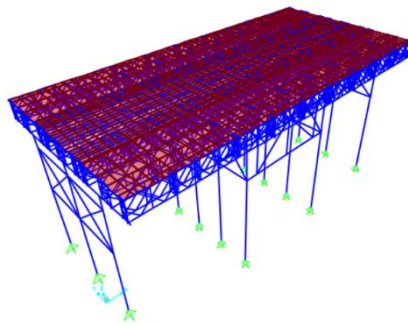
The 6 x 32m Track Switch Continuous Girder of Pujiang Special Bridge (Piers 12 to 14) overall model of bracket
